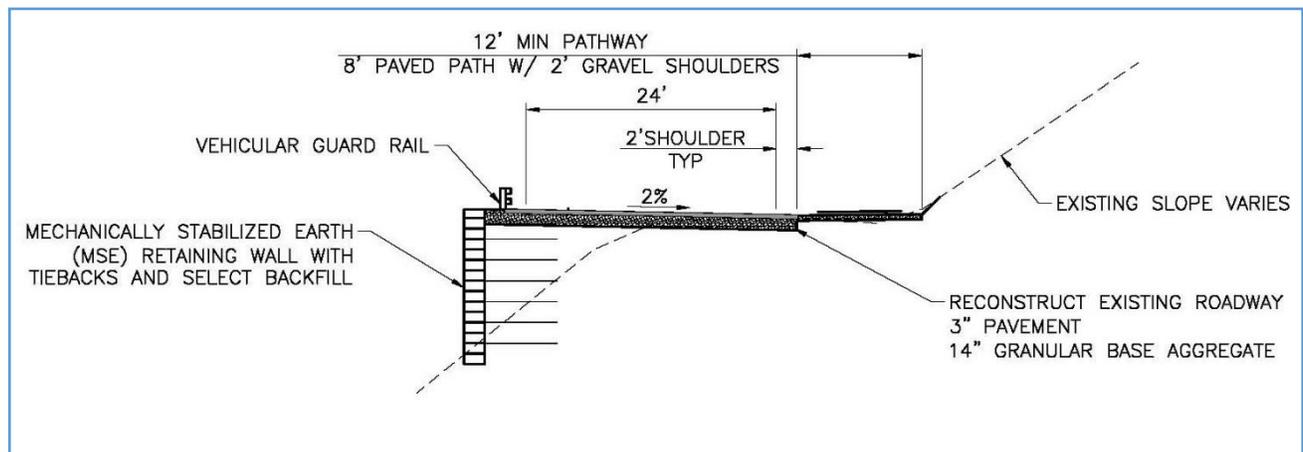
TYPICAL SECTION – ALTERNATIVE 6 - LOWER ROADWAY (BELOW UPPER HAIRPIN CURVE)
